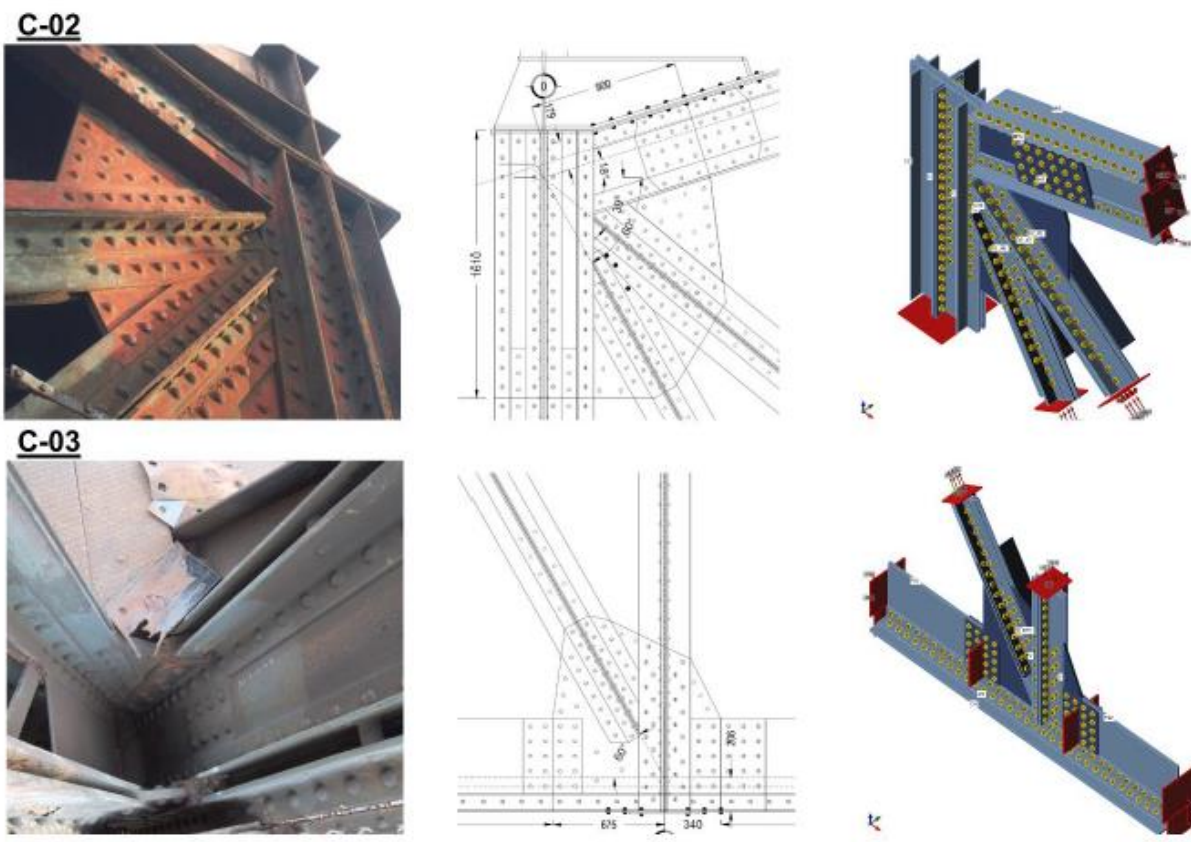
Type of connections of Steel Bridge near Vyšehrad. Ref. [2]
